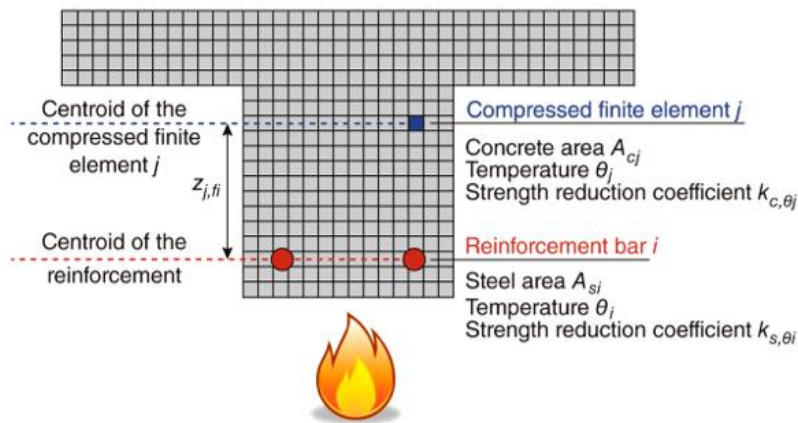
Reinforced concrete section discretized by a finite element mesh.
